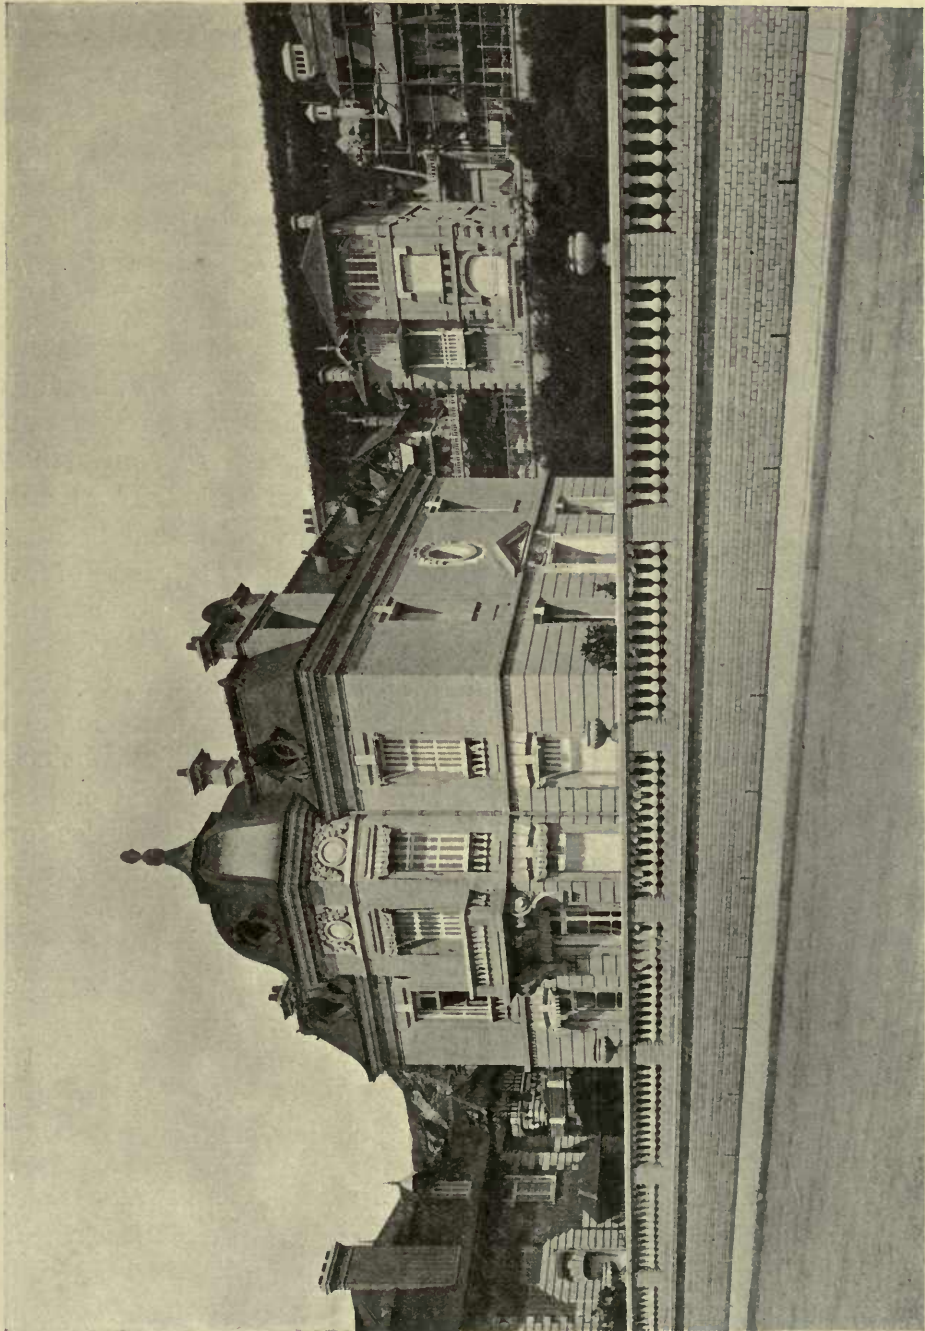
Villa and Boundary Wall built of Lime-Sand Bricks
